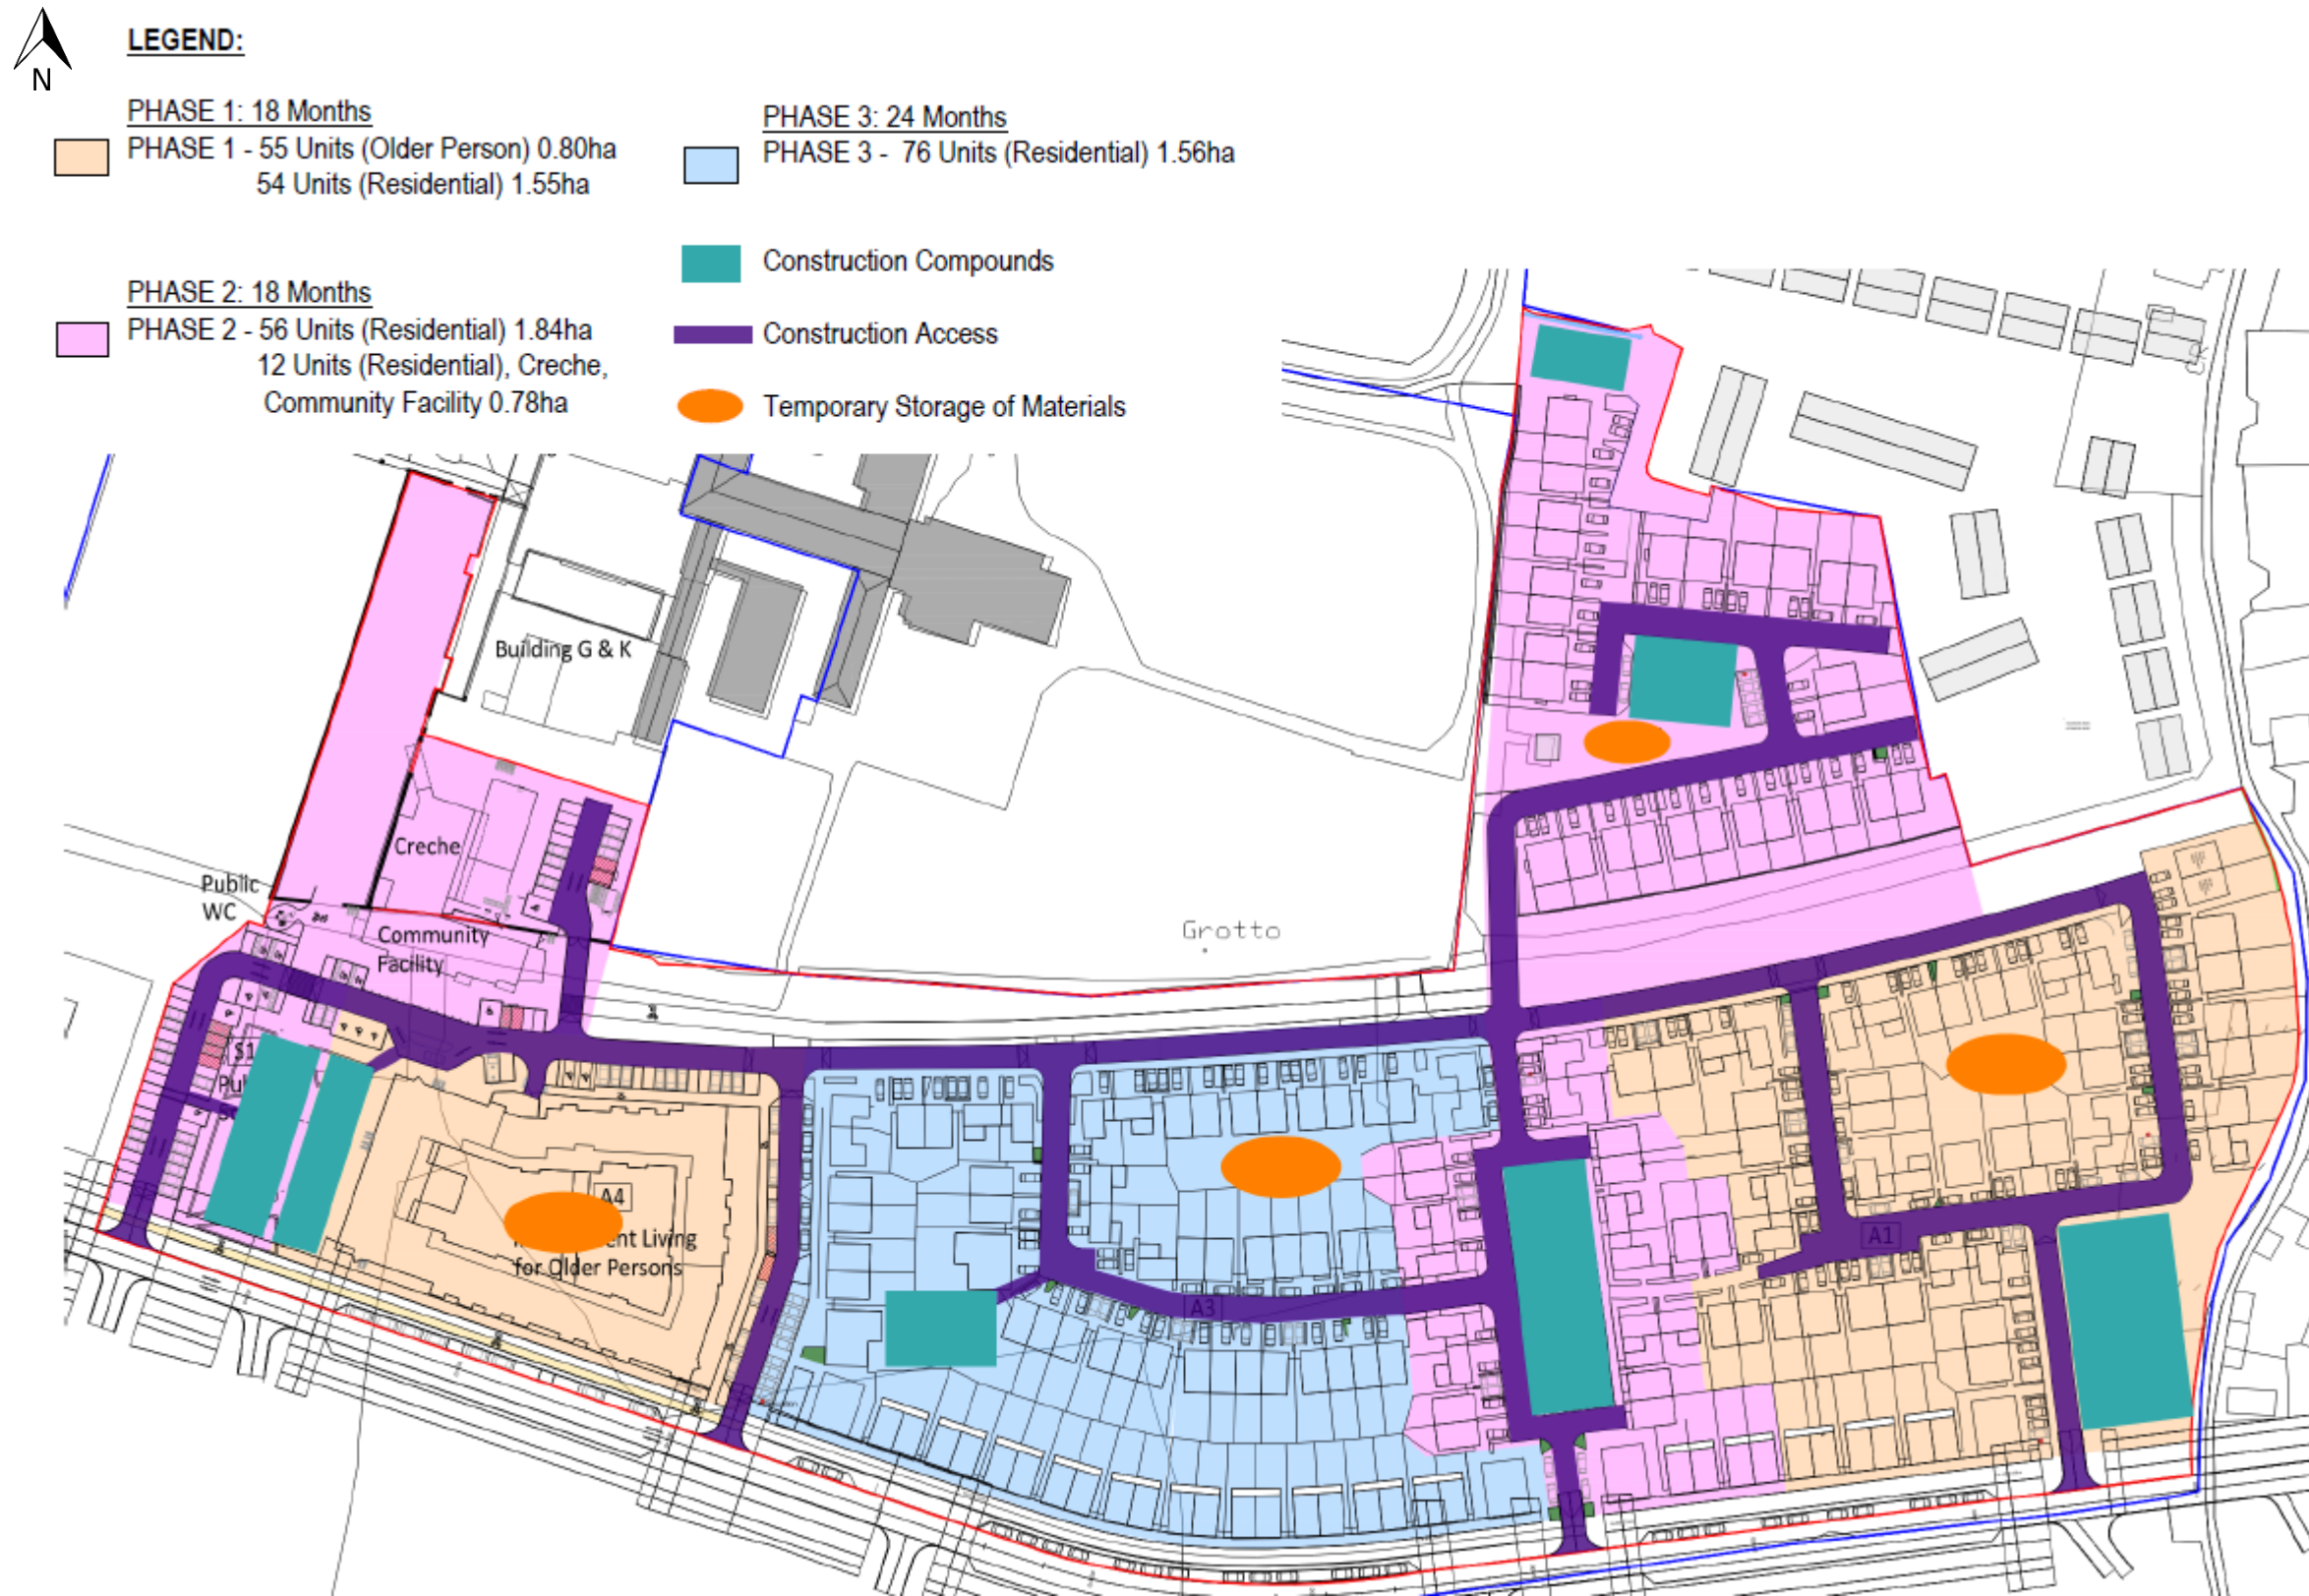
Phasing Plan | Not to scale | Based on information provided by: EML Architects
